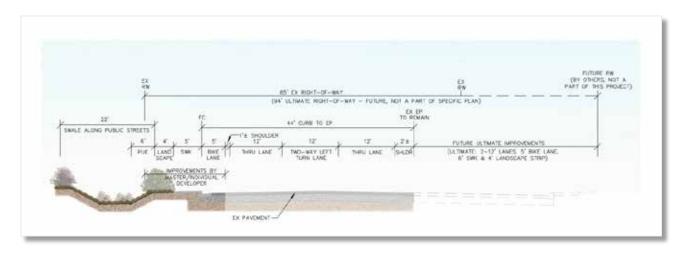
Proposed Harris Road, Southwest of Harris Place (no parking allowed)
